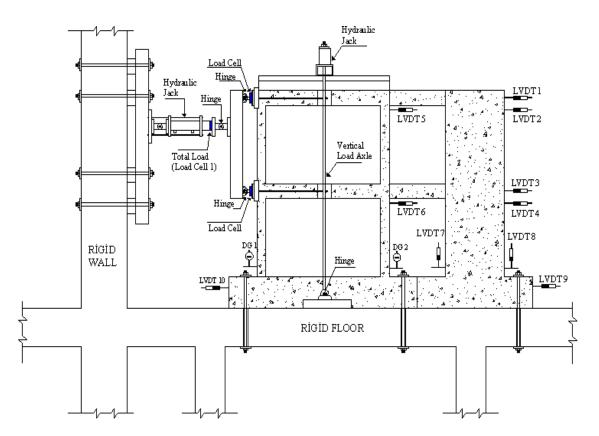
Loading system of the 2nd group tests (G<sub>2</sub>-S<sub>3</sub>) (Ozturk, 2010).
